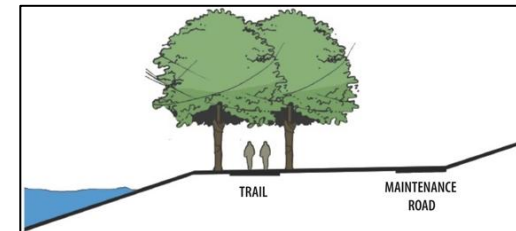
Illustrative section of the west side of the Bypass Channel
